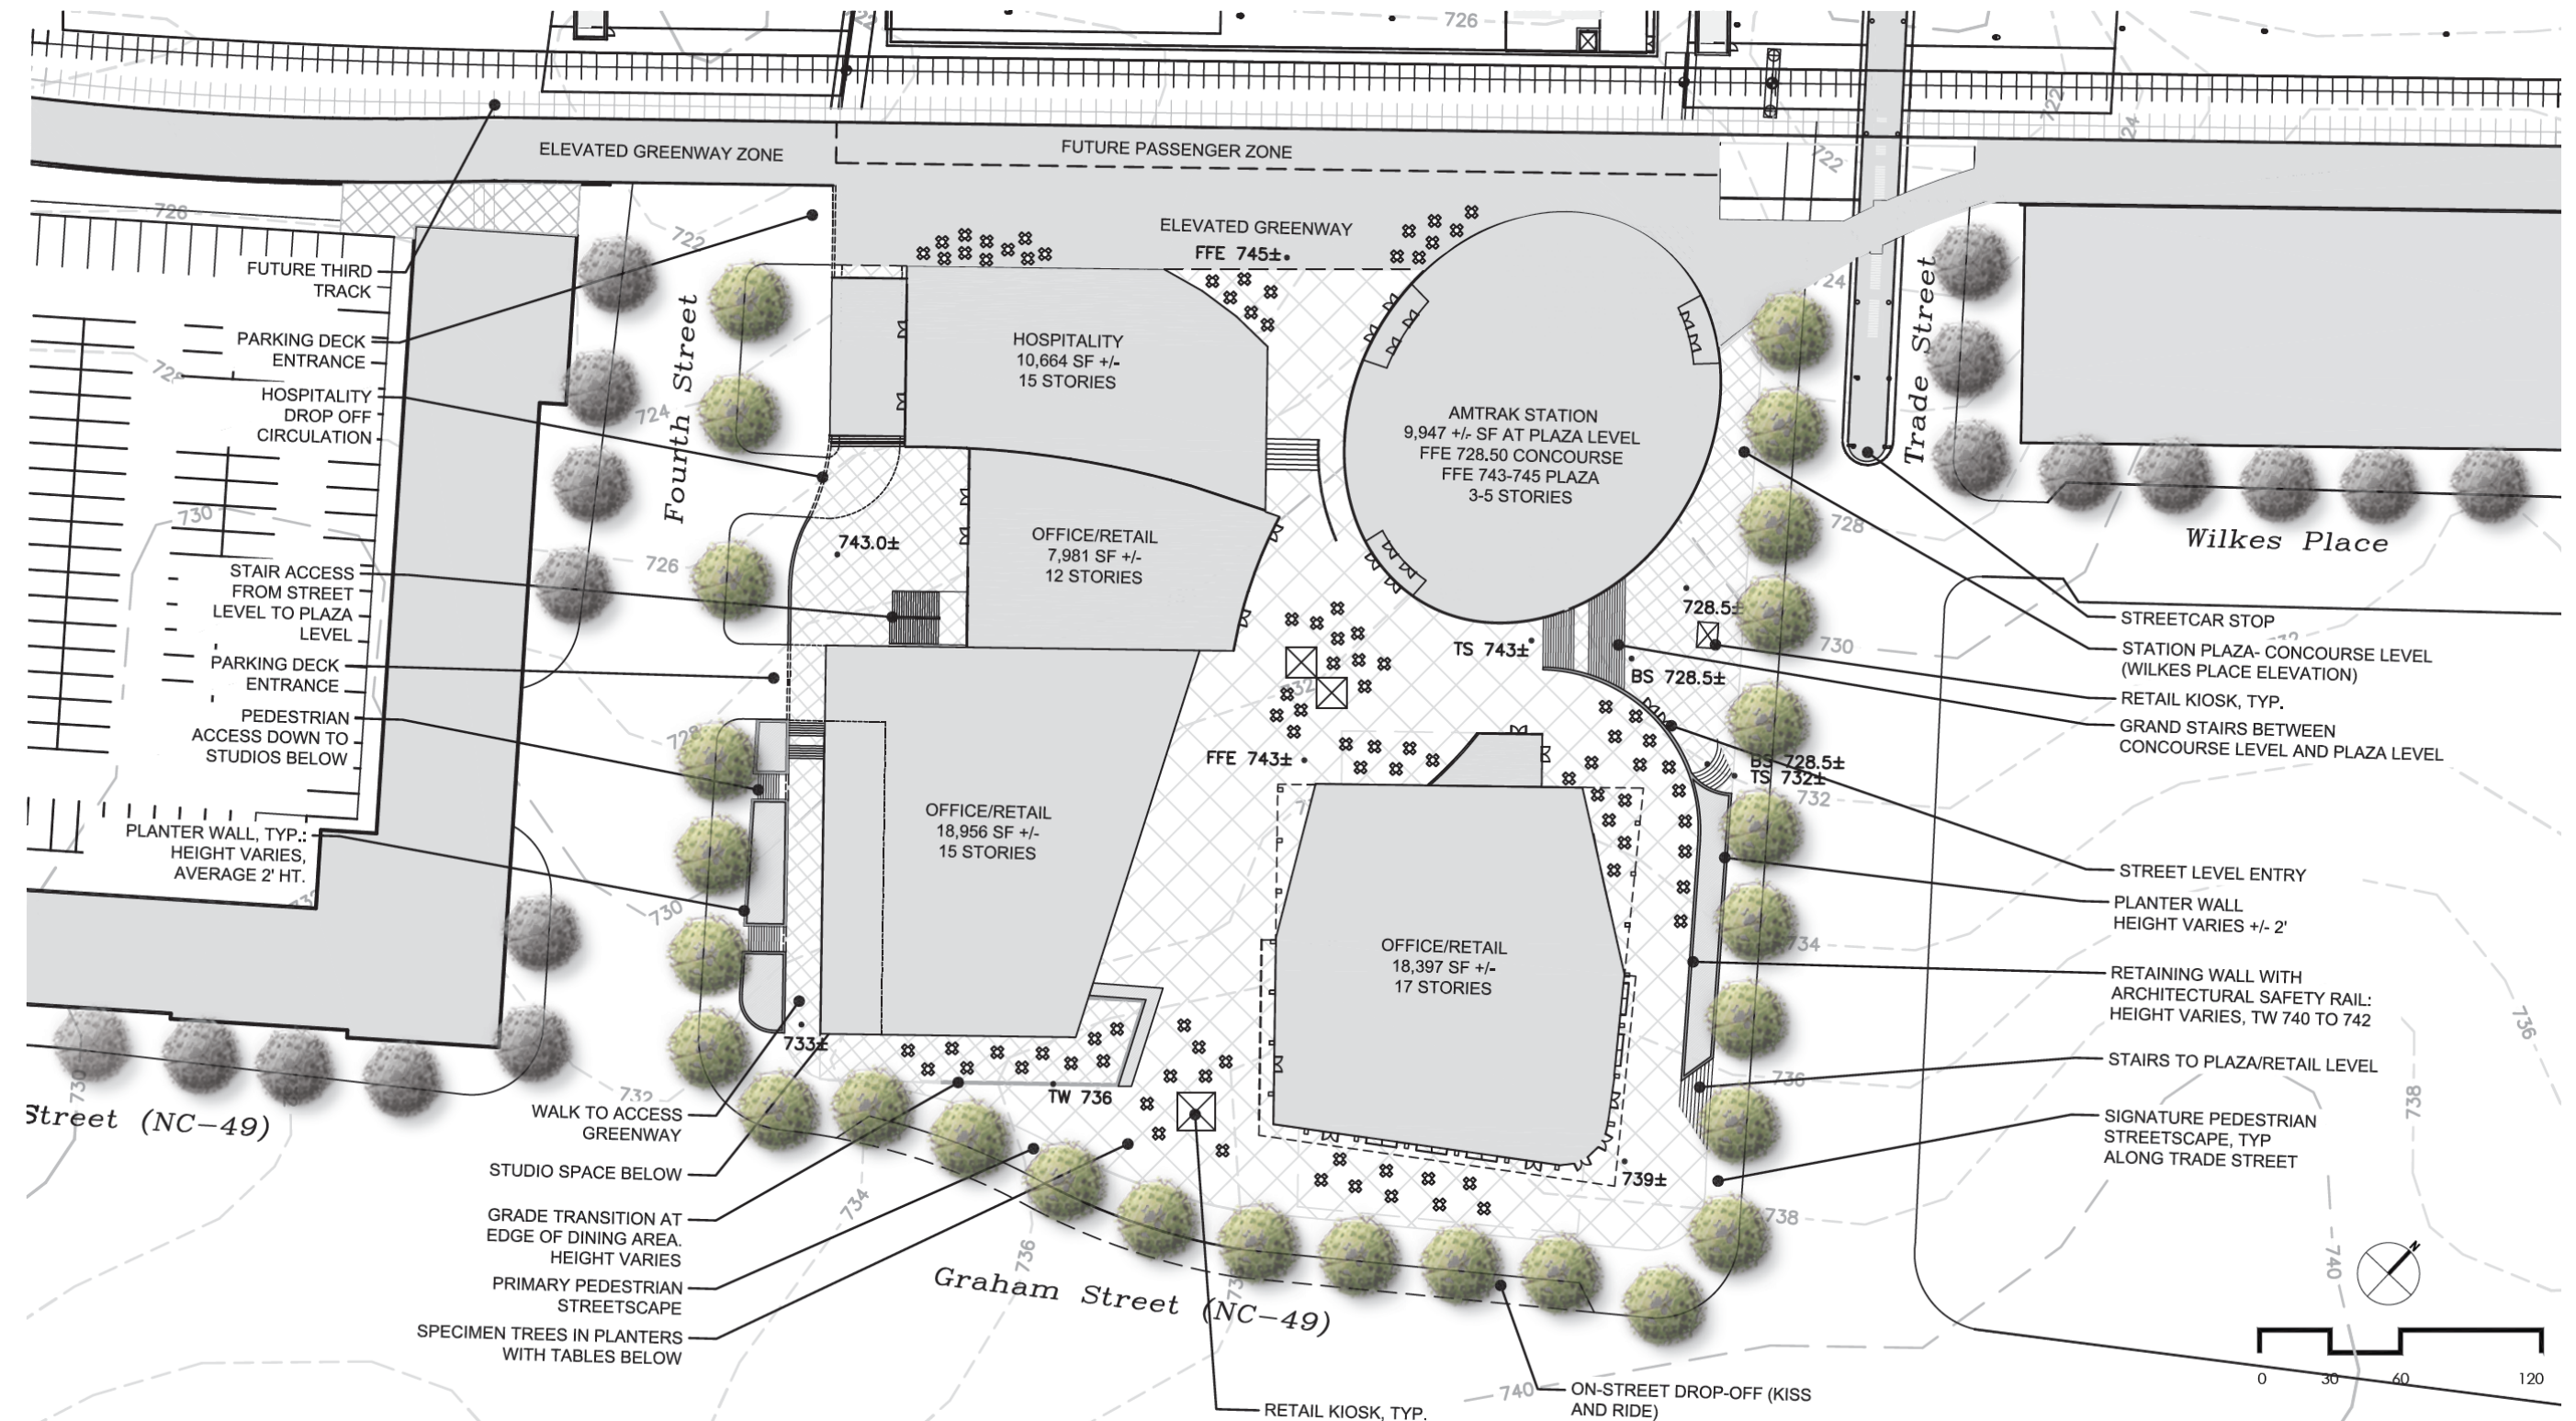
Main Block Site Plan (Parking Level 1 / Concourse Level)
